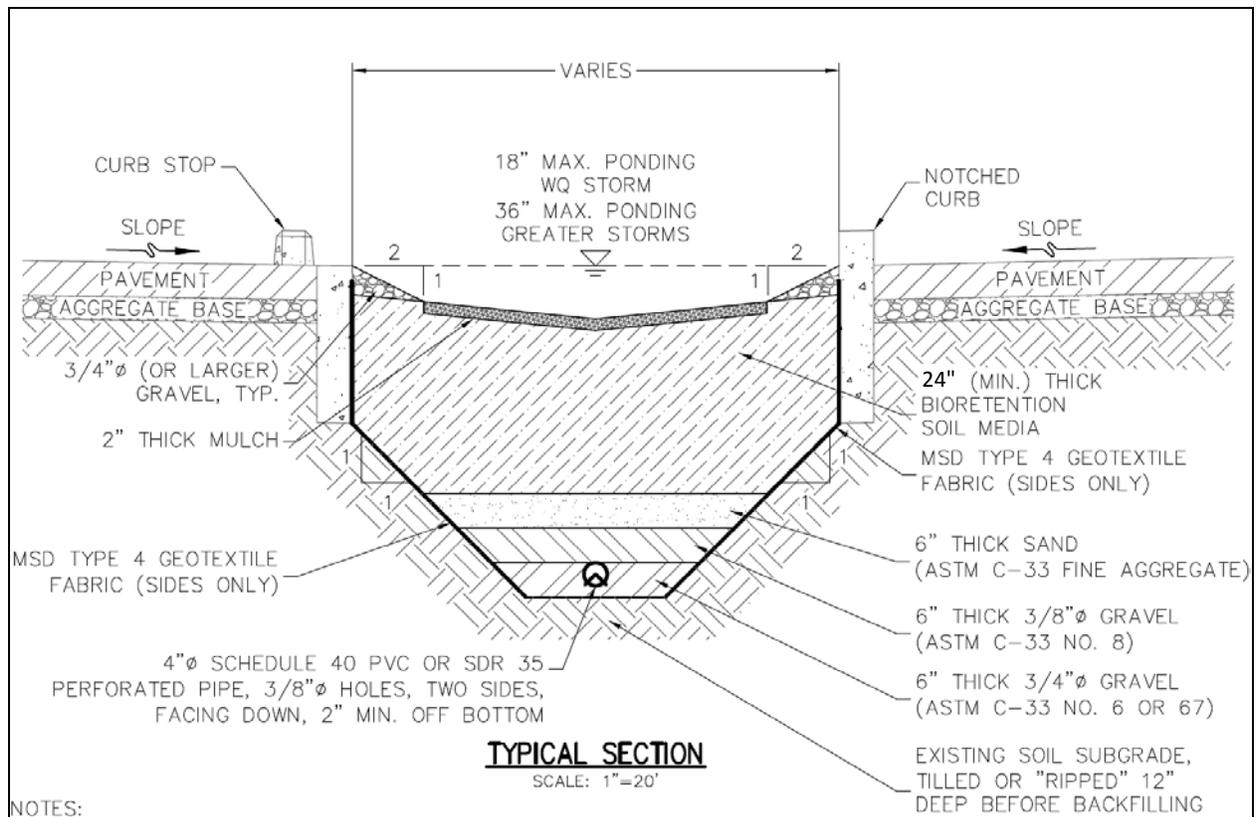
Rain Garden Typical Section (Source: MSD, 2010).
